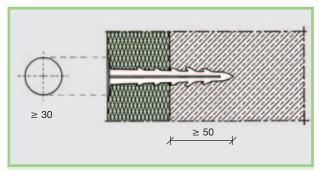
Plastic nails for additional anchoring of Styrodur® 2800 C (units in mm).
